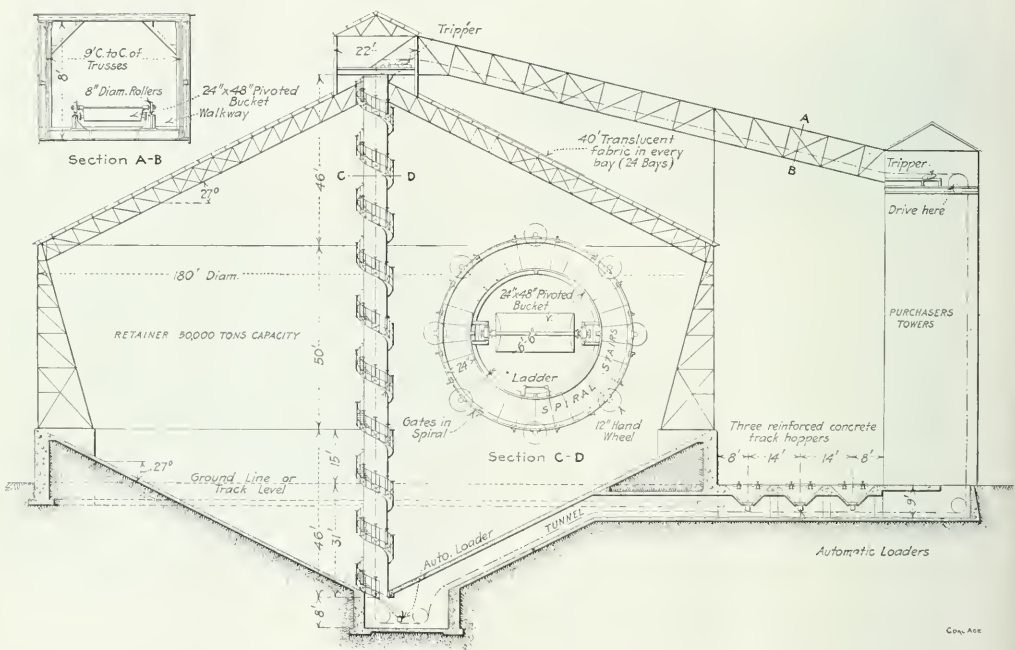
CROSS-SECTION OF A SINGLE UNIT, SHOWING SOME DETAILS
